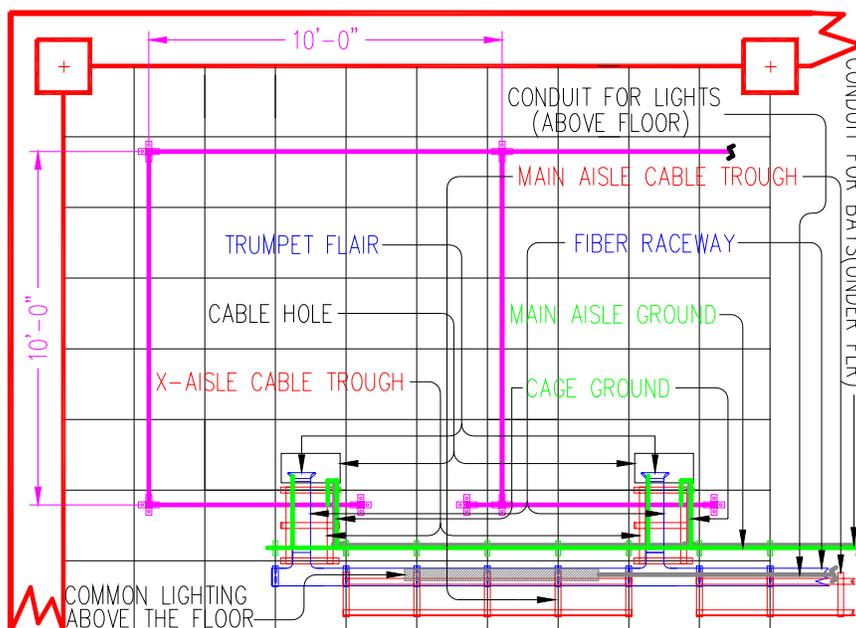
TYPICAL RAISED FLOOR 10 X 10 CAGED COLLOCATION AREA
